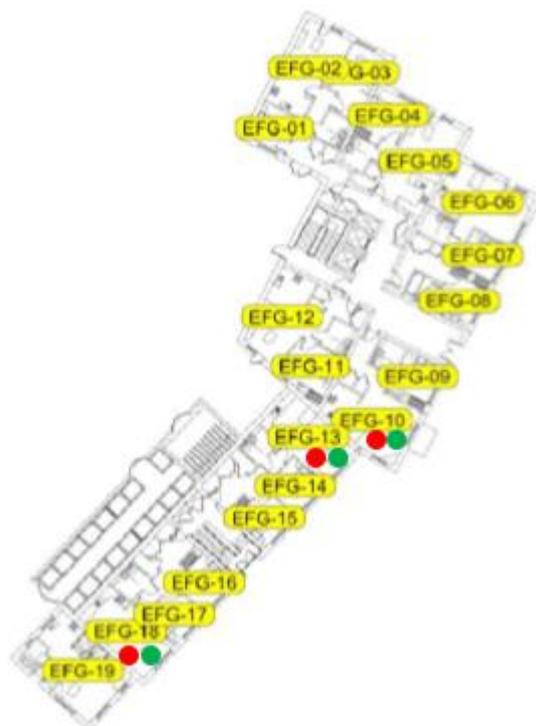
Block EFG ground floor, ADF (red) and sunlight (green) failures marked.
